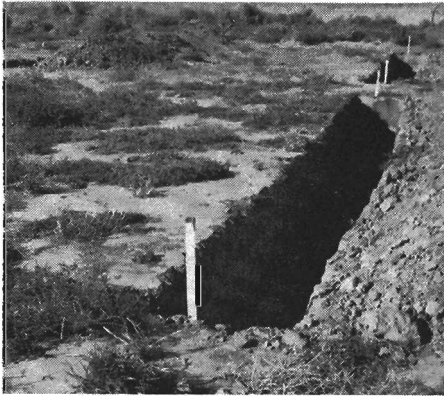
Independent trenches prior to placement of polyethylene and gravel. Adjacent trenches located 20 feet apart.
